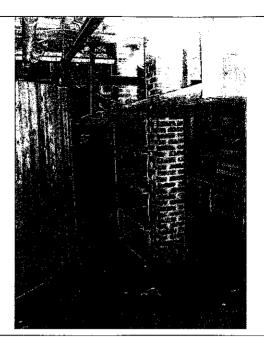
04/27/05 - Maple Hill (Building #20): South elevation with patched area from the fire.
